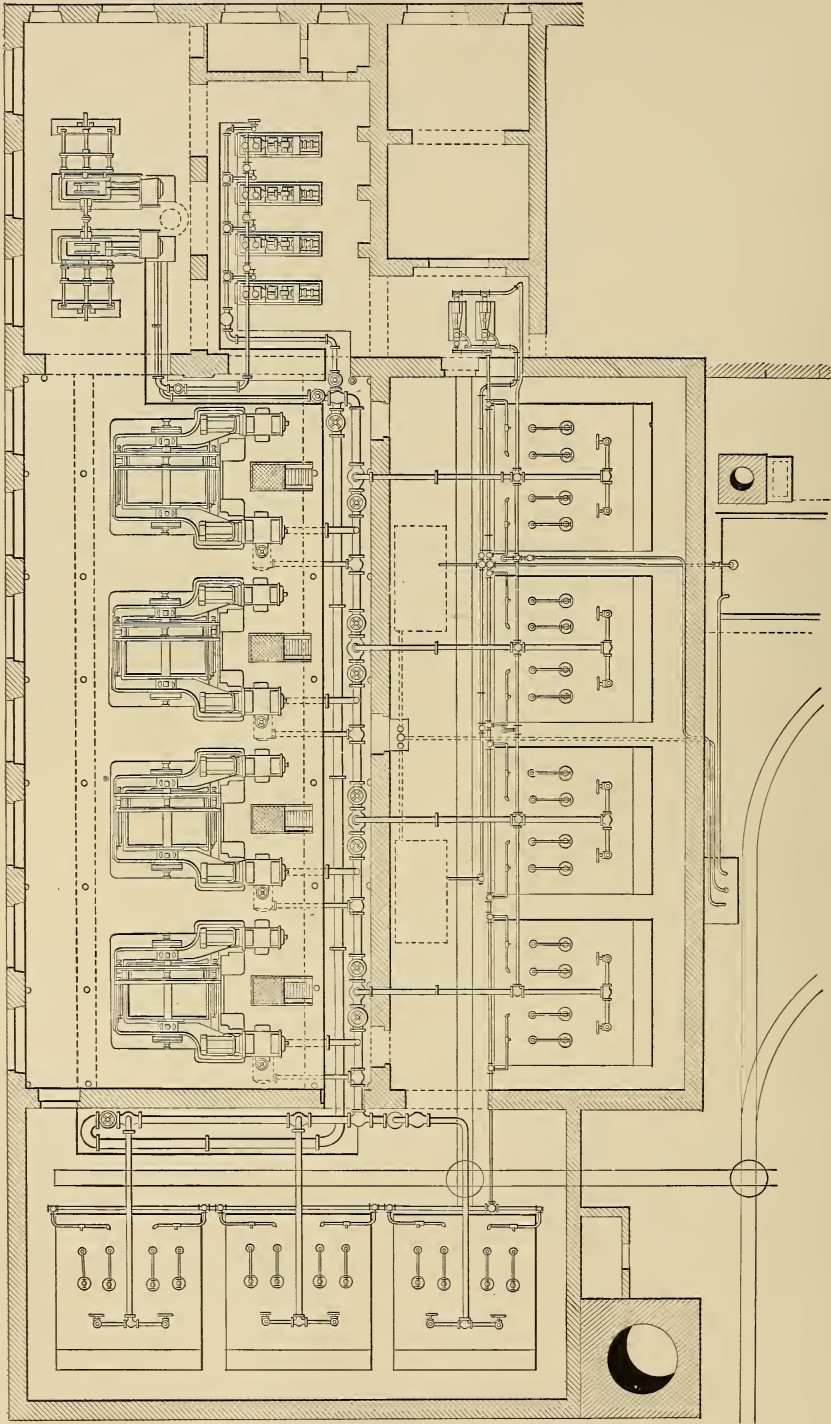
A PLAN OF THE STEAM CENTRAL STATION AT CERCHI, ROME
